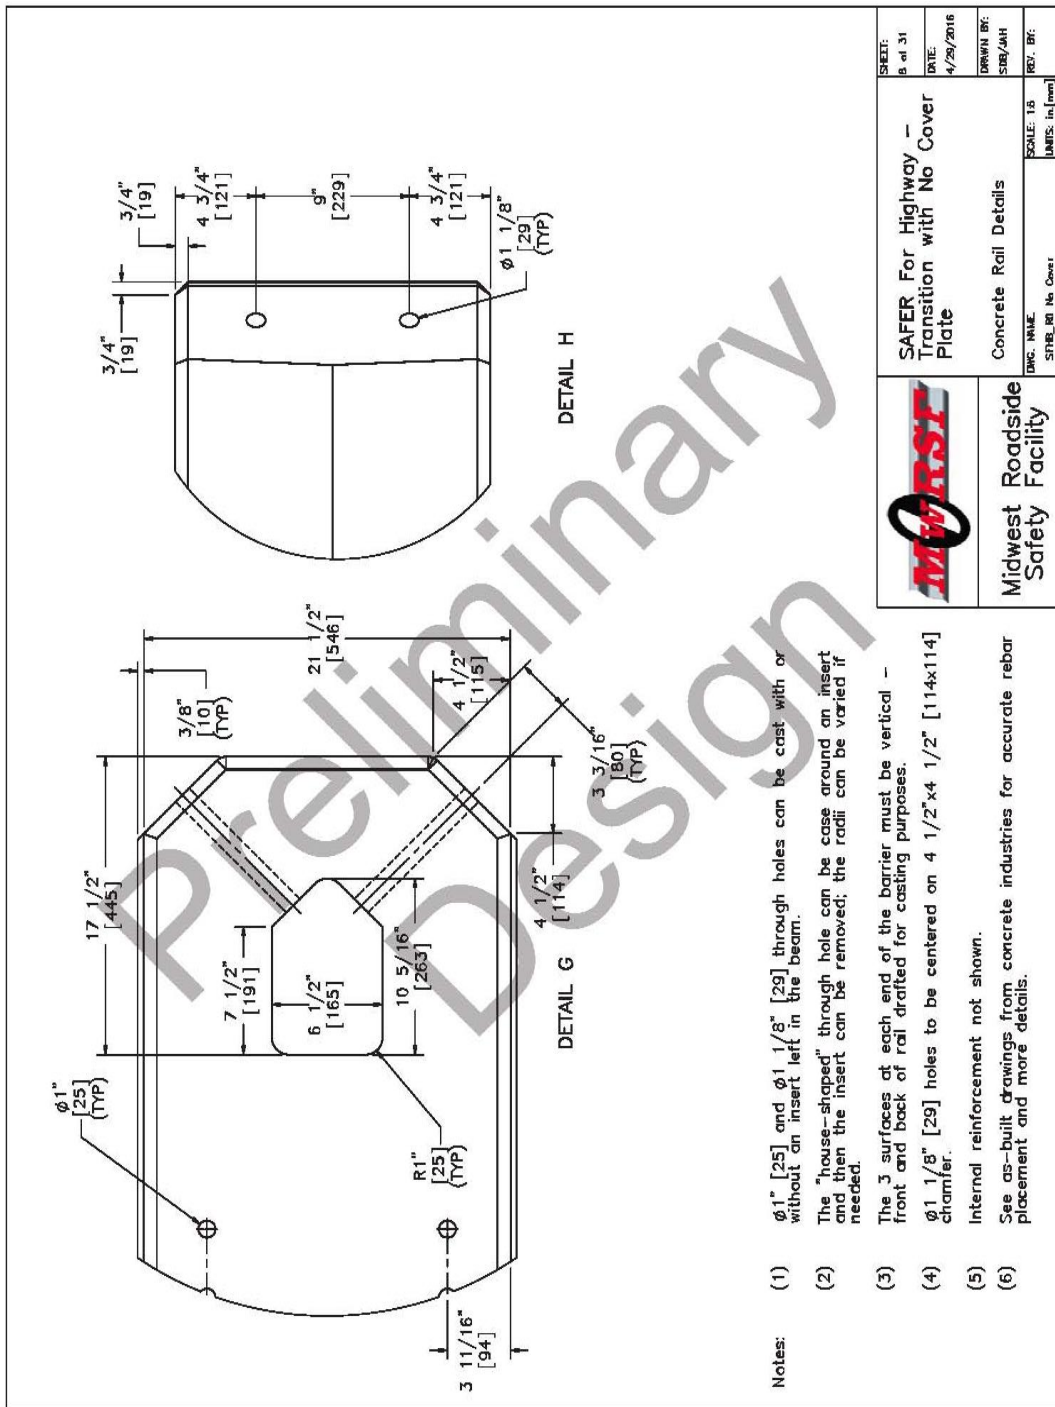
Concrete Rail Details, No Cover Plate, RESTORE Barrier Transition
